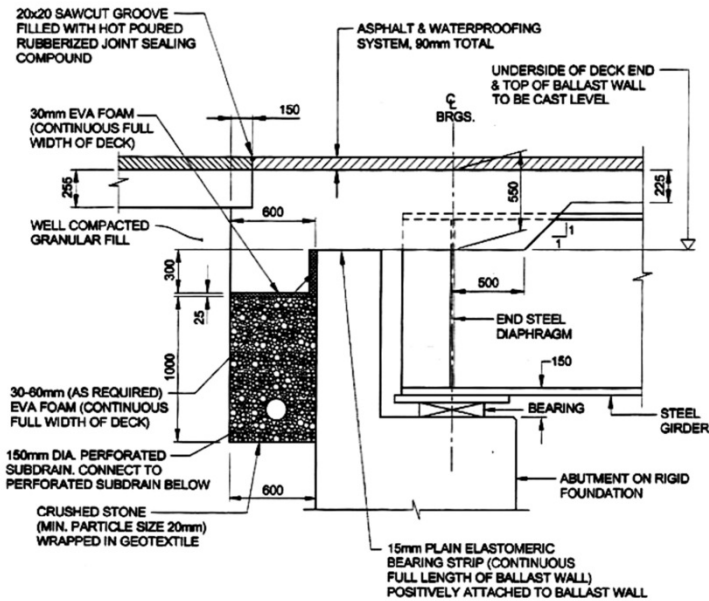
Semi-integral abutment configuration: steel girder with concrete deck and deck overhanging the ballast wall (expansion length greater than 40m) (Husain, 2004)
